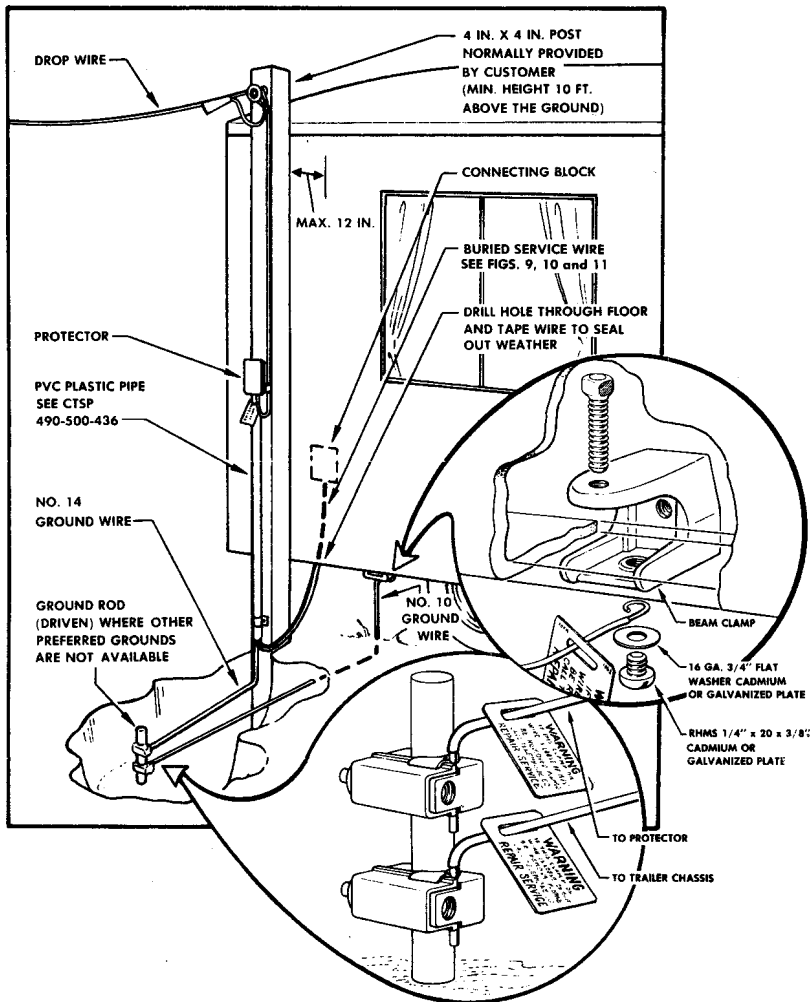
Typical Installation—Aerial Distribution, Ground Rod Ground
